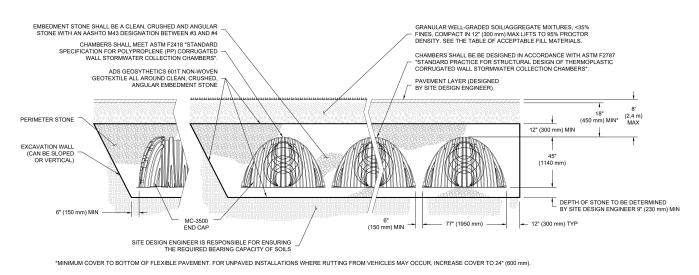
A - MC-3500 Structural Cross Section Detail (Not to Scale)
